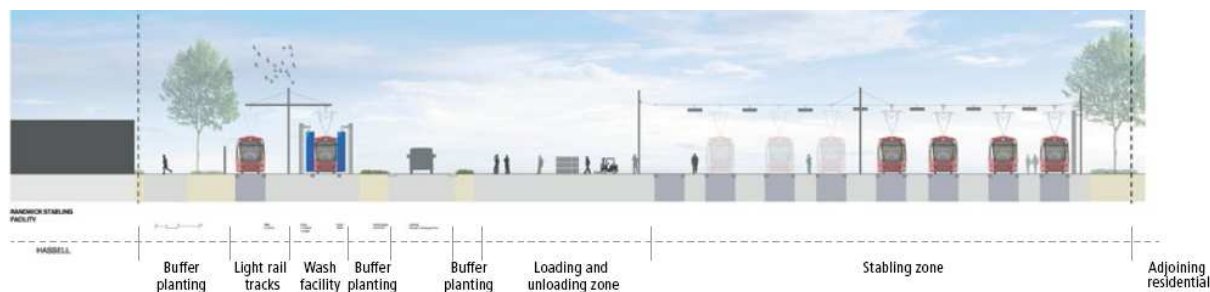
Typical section through proposed stabling yard within RRR.
